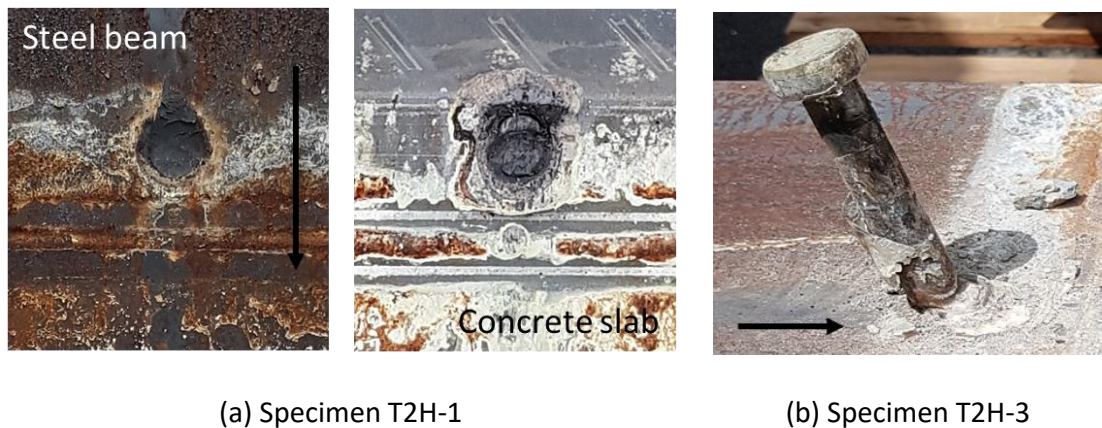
Failure of the 0.9-mm through-hole-welded specimen at FLS
